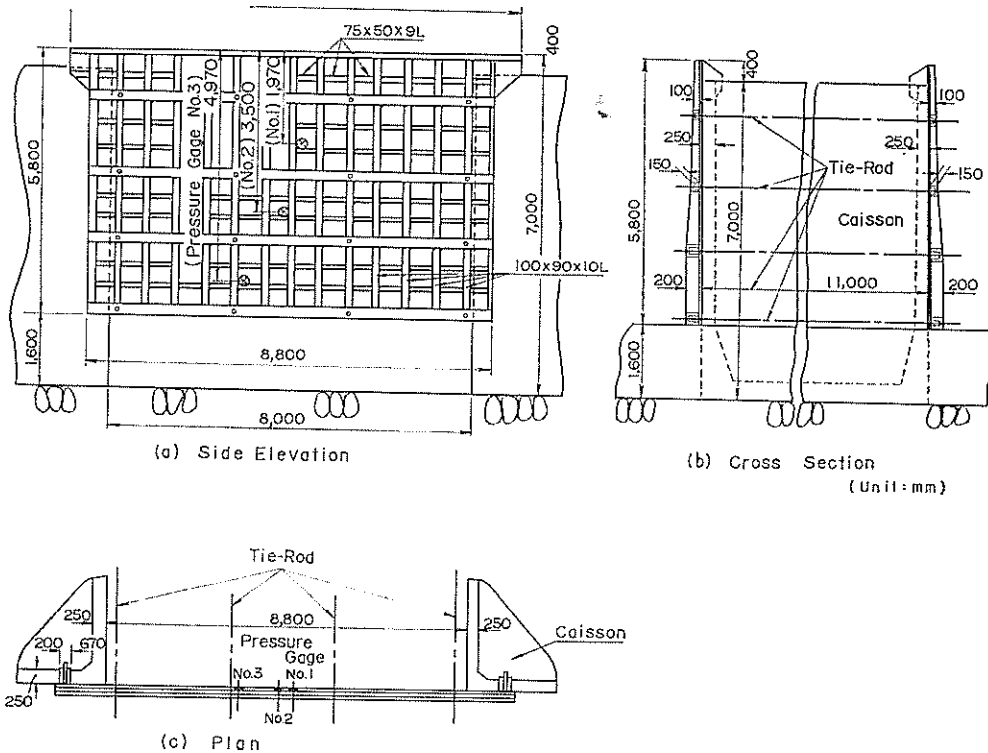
Shapes and Dimensions of Forms and Locations of Pressure Gages
